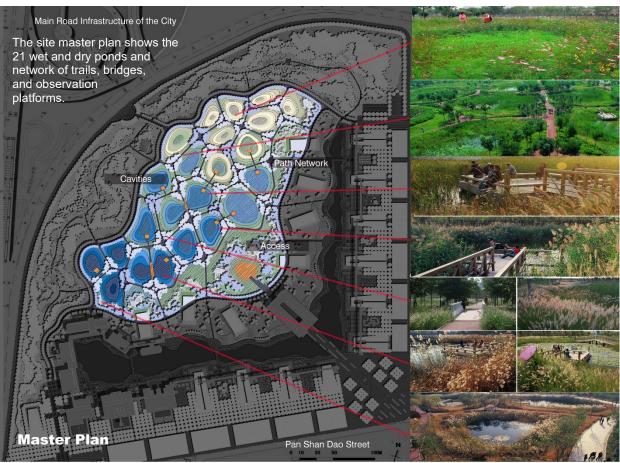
Park's Site Plan for the various ponds, Source: Turenscape, 2009
